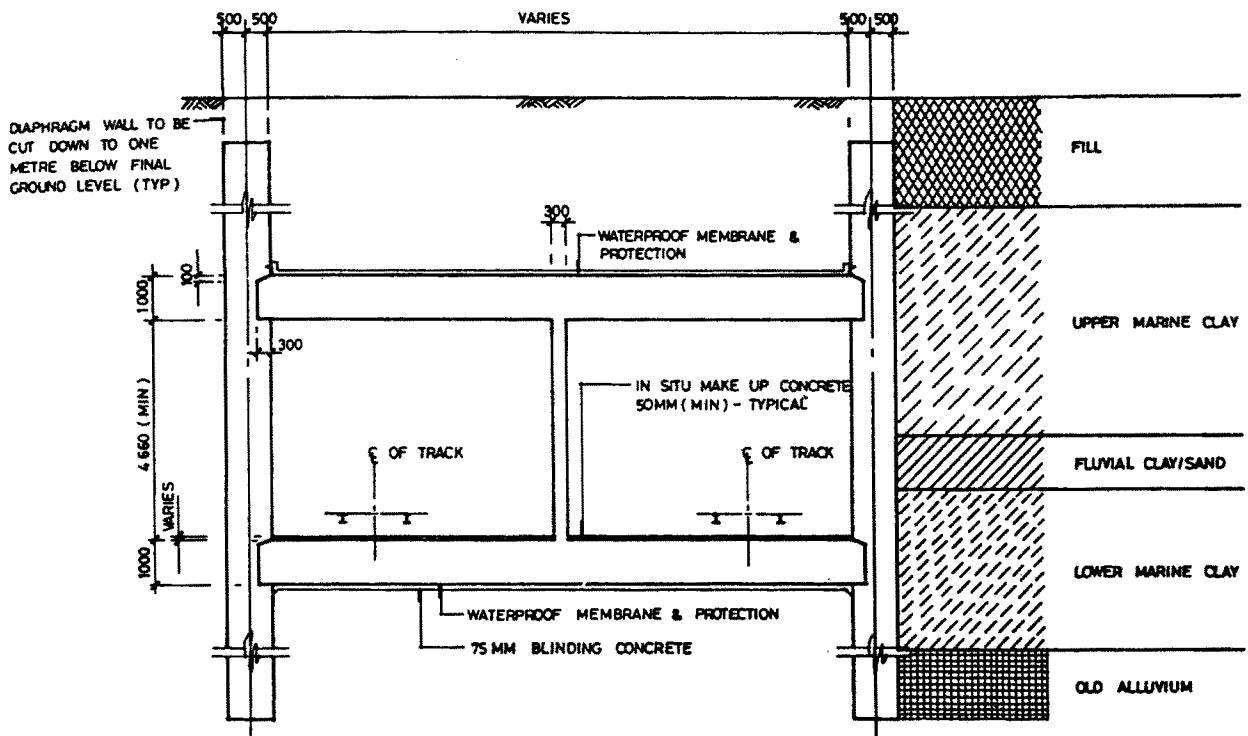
CONTRACT 301-TYPICAL CROSS SECTION OF CUT & COVER TUNNEL
